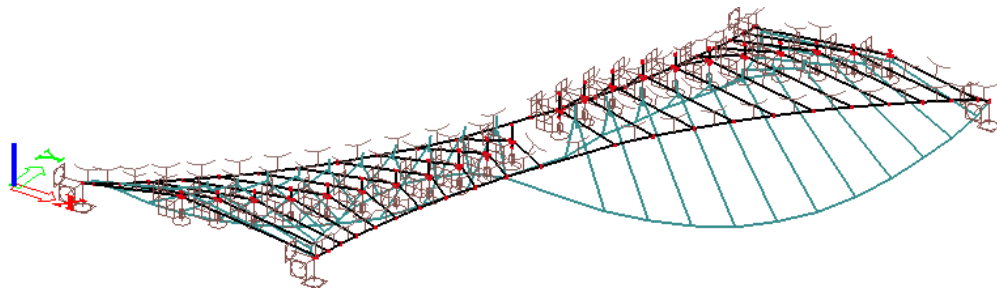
DEFORMED ANCHORING SYSTEM IN 3D
